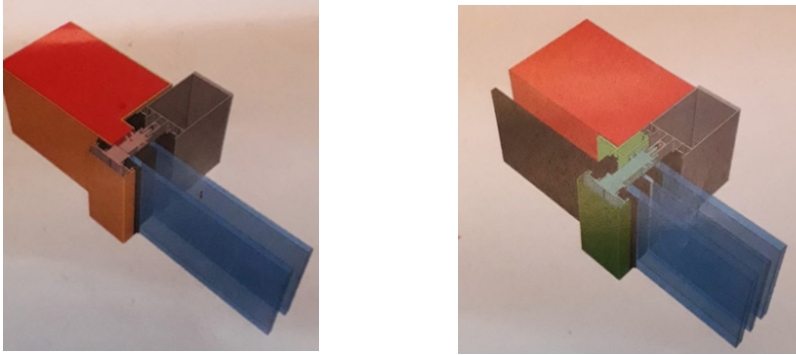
Example to make an existing façade adaptable, with the light green pin (DeGroot&Visser).
